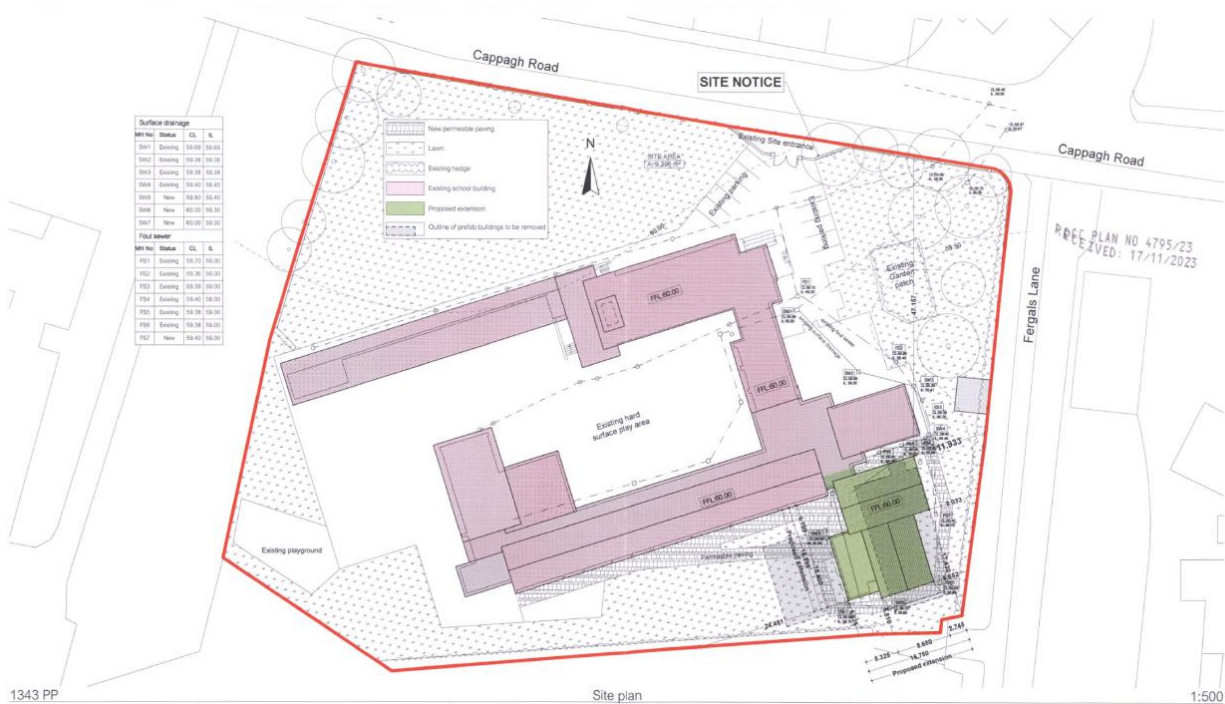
Extract of Site Plan submitted as part of PA.Reg.Ref.4795/23 (Source: McGahon Architects as displayed on the DCC planning register)
